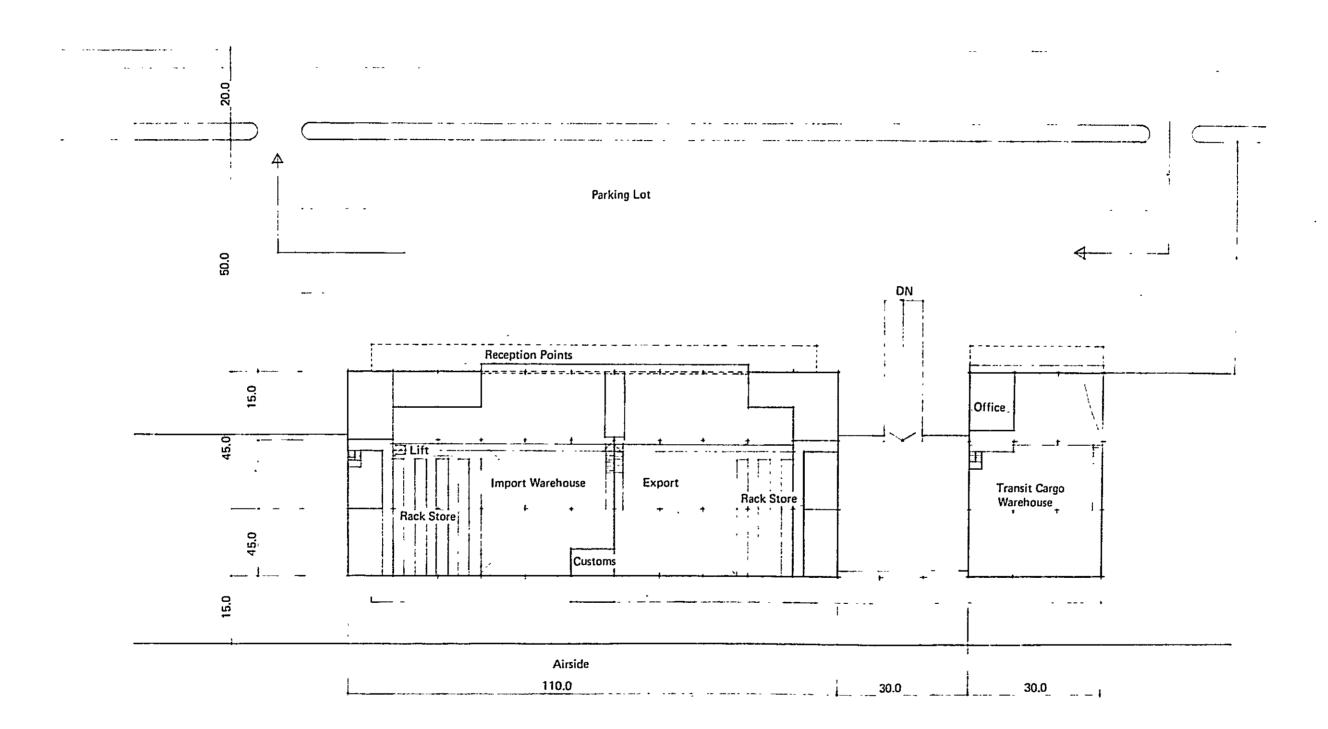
Proposed Cargo Terminal Building Basement Floor Plan
